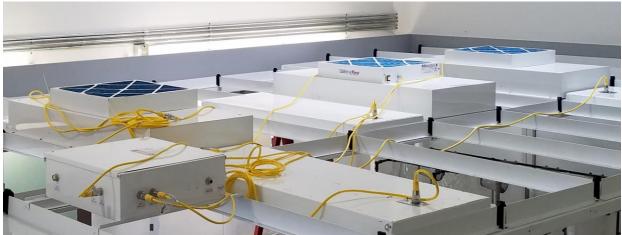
Typical ceiling grid during installation with PDM, three FFUs, and three Fluorescent Light Fixtures visible (blank ceiling tiles have not been installed yet)
